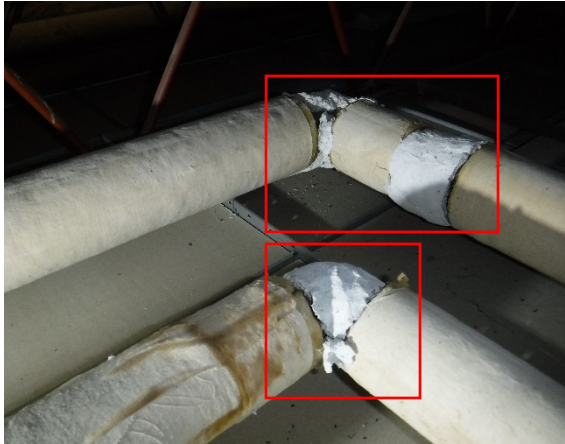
Example Photo of Poor Condition, Unwrapped ACM Piping Insulation, Fitting – Room 100, Ceiling Cavity.
